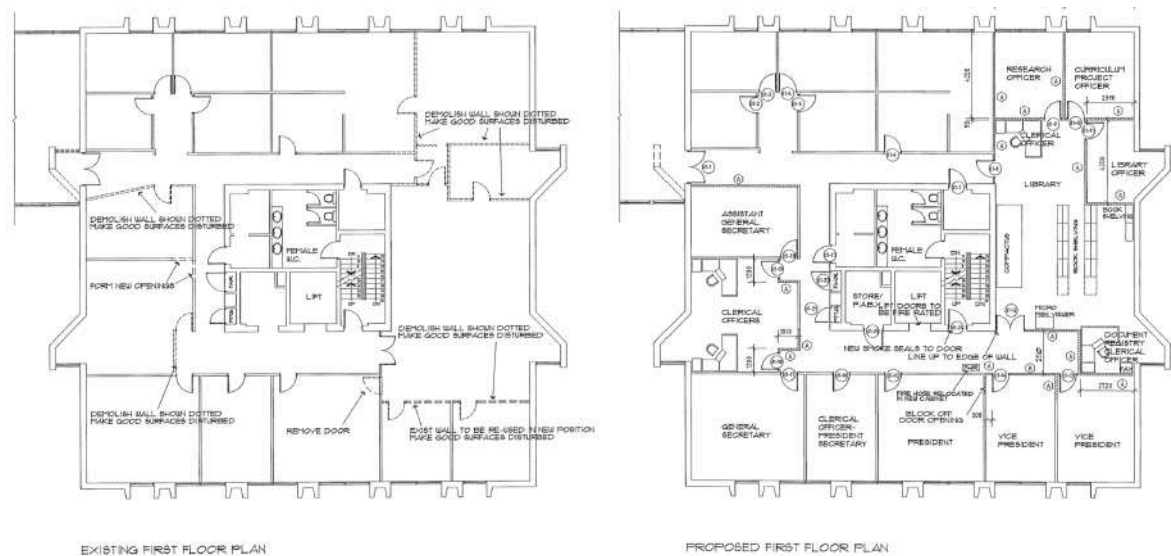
Existing and Proposed First Floor Raggatt House, 1993 [Source: Resource Development, Drawing No. 93-418-06]
